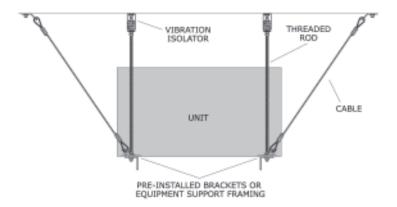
Side view of vibration isolation suspended attachment to the building structure.
